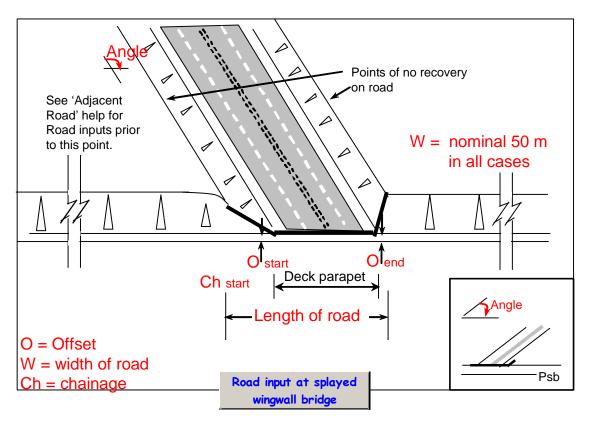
(f) Road crossing under Road at structure with splayed wingwalls
